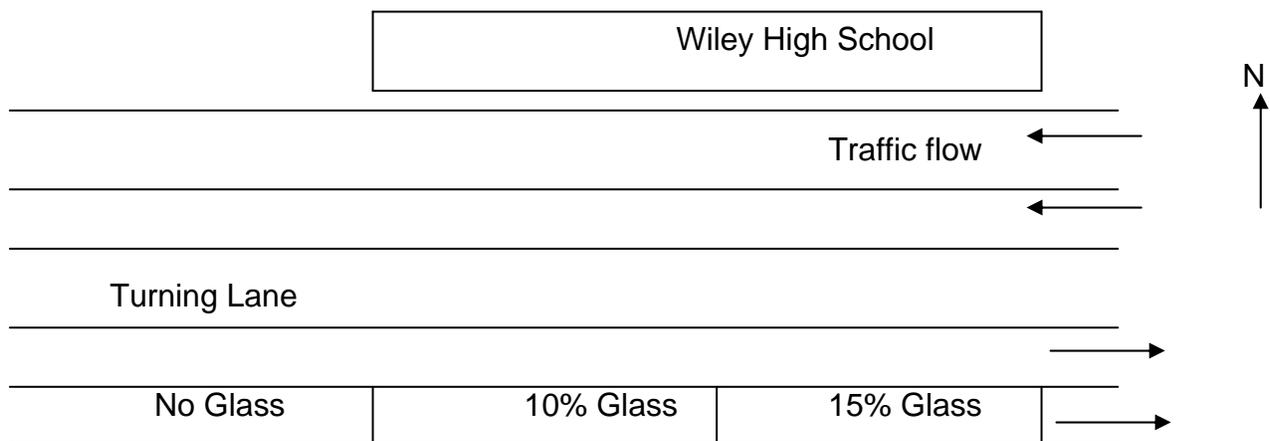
Schematic Drawing of the Test Project #2 Site Location
